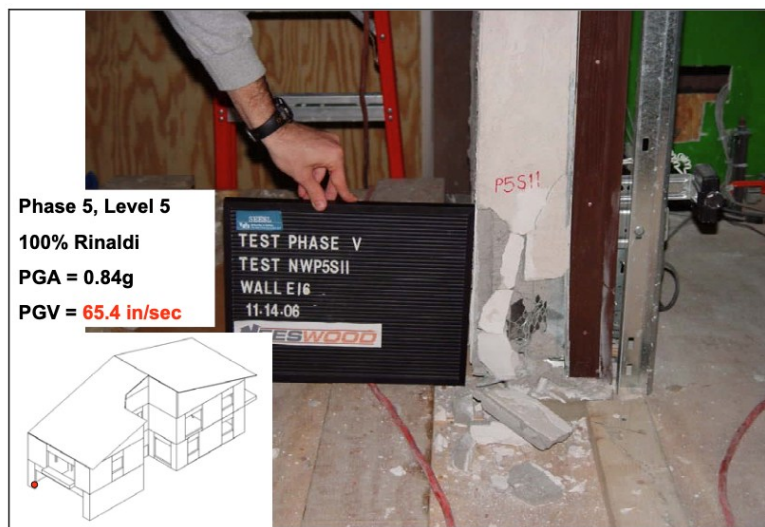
Cracking and Spalling of Stucco at the Bottom of Garage Wall (Christovasilis et al., n.d., 2009)
